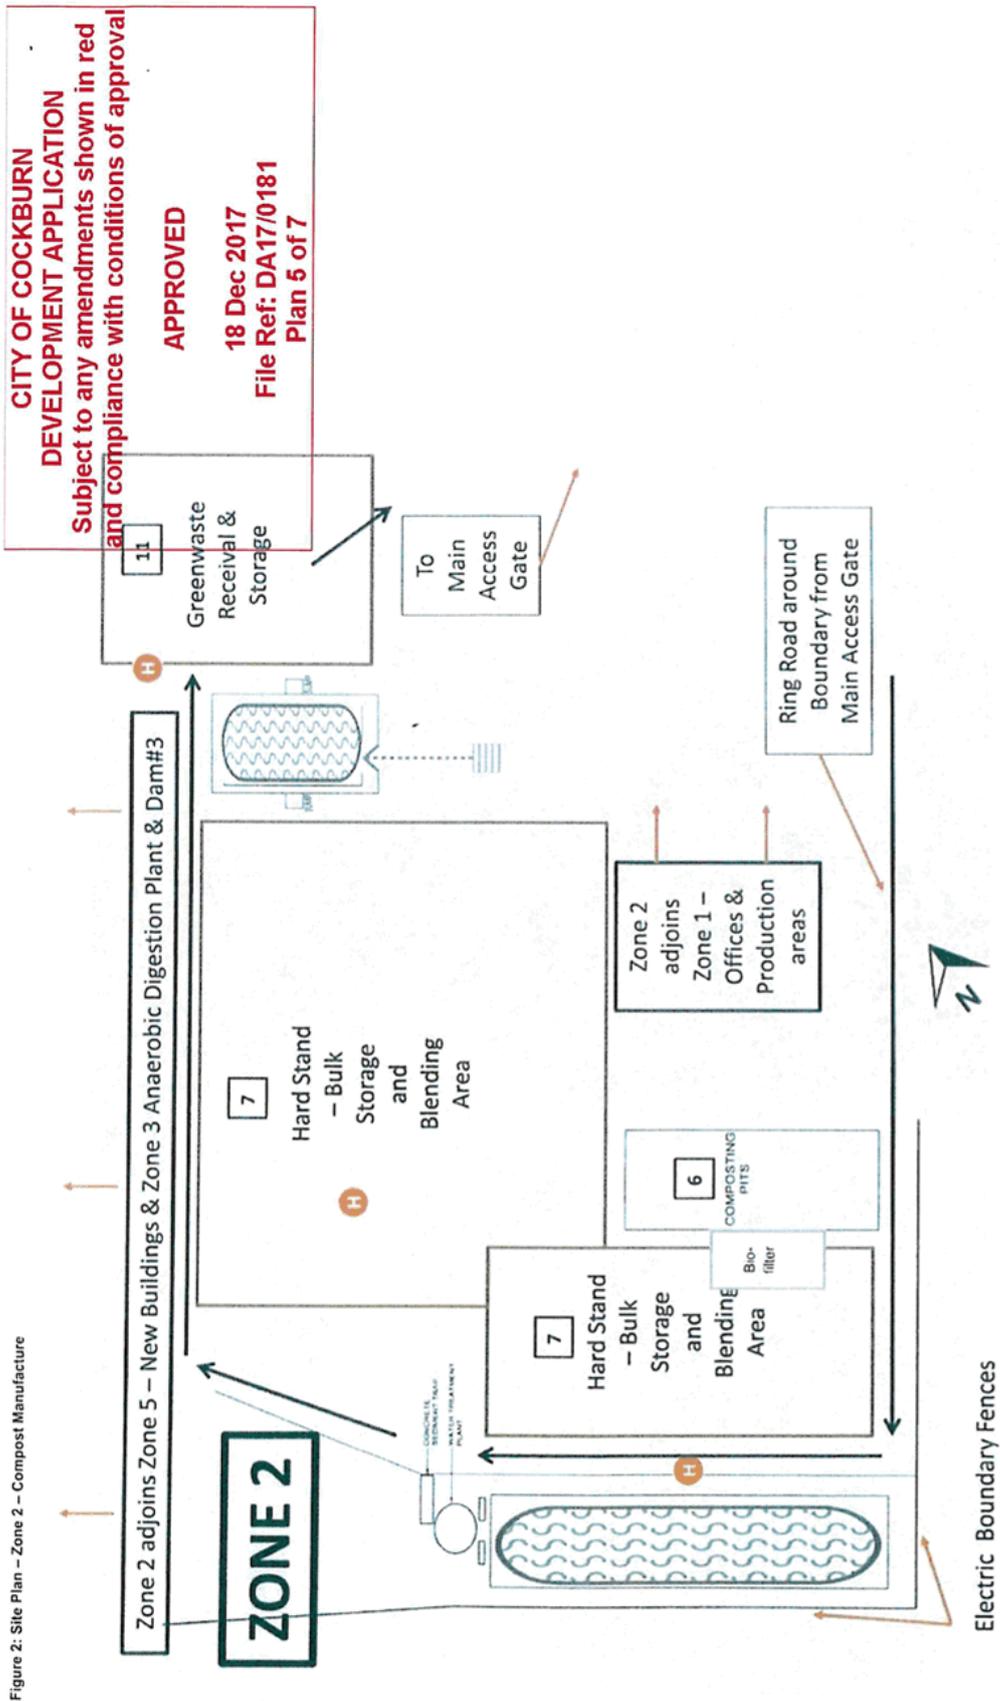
Site Plan - Zone 2 - Compost Manufacture
